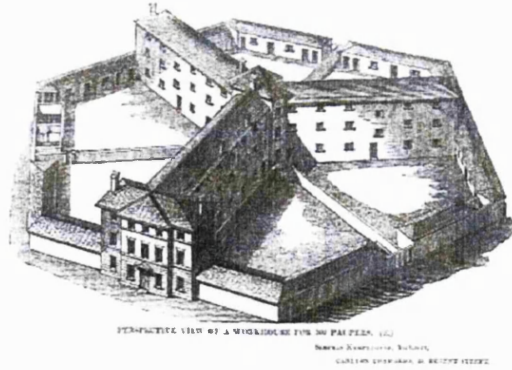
The first new workhouse erected under the 1834 Act was the hexagonal workhouse at Abingdon for which Kempthorne himself was the architect. This is Kempthorne's drawing of the basic type which was closely followed by Manners in Bath. (*Workhouse Architecture*, users.ox.ac.uk. Patrick Higginbotham.)
